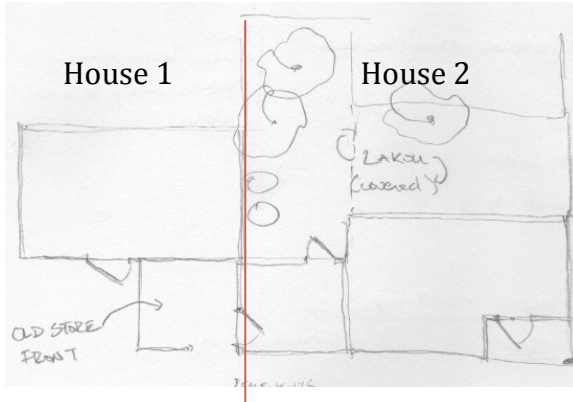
Floor plans of two houses in the Airport Industrial camp, Port-au-Prince.
